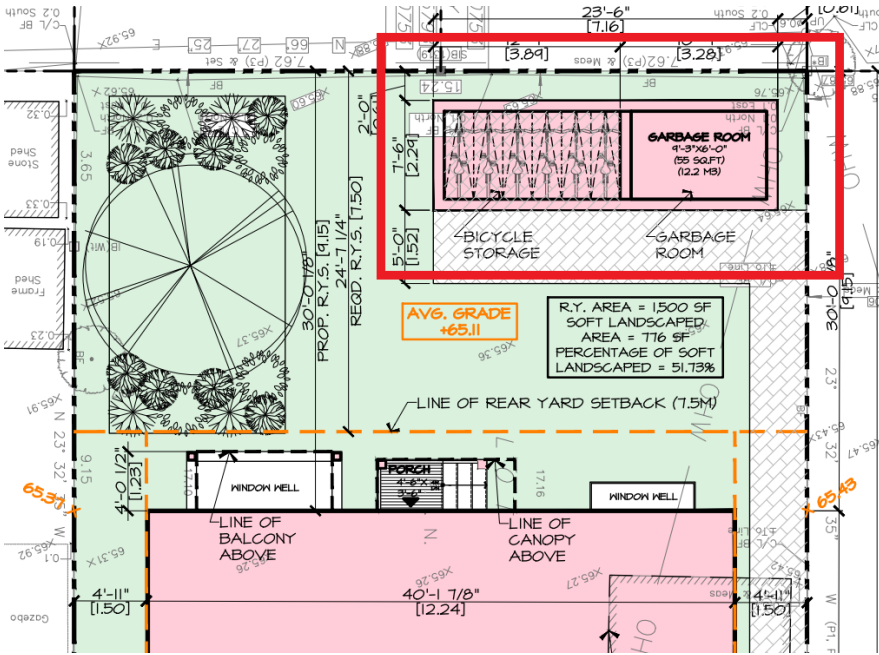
Excerpt from Site Plan Showing Garbage Storage Building Location at Rear of Subject Property
